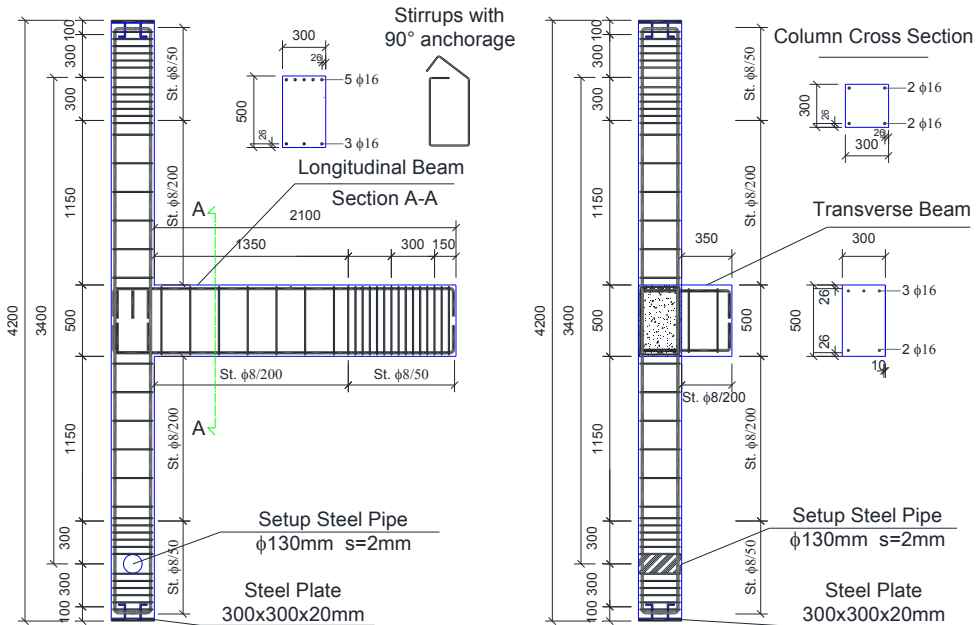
Tested specimens: geometry, internal reinforcements and details.
